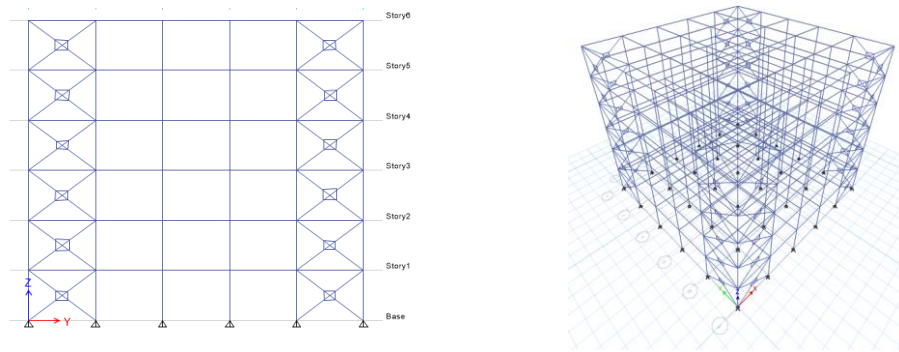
2D and 3D view of steel frame with dampers at end frame of all storeys
